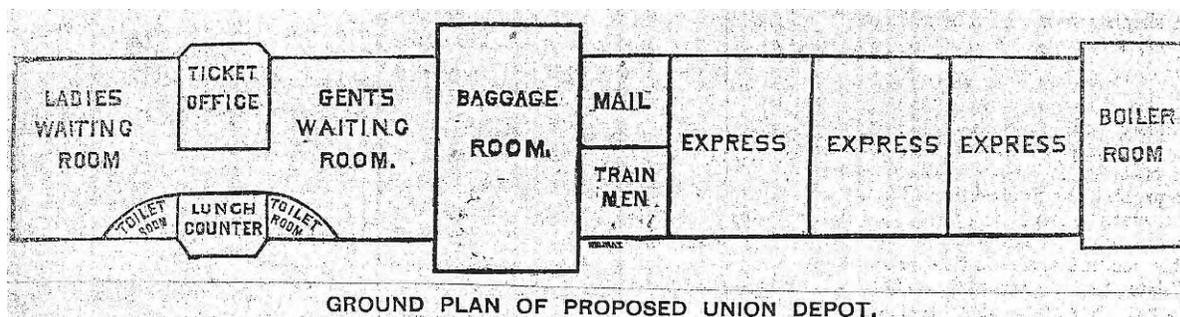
Schematic floor plan of the Keokuk Union Depot published in May 1890.
